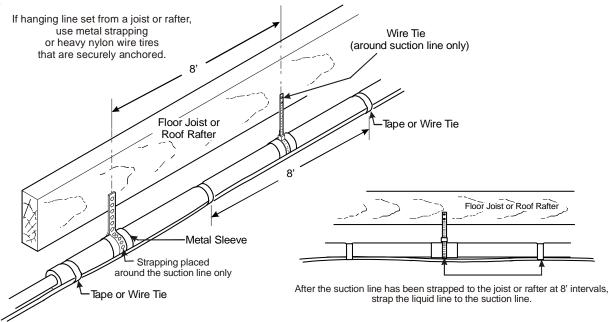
Installation of Refrigerant Piping (Horizontal)
